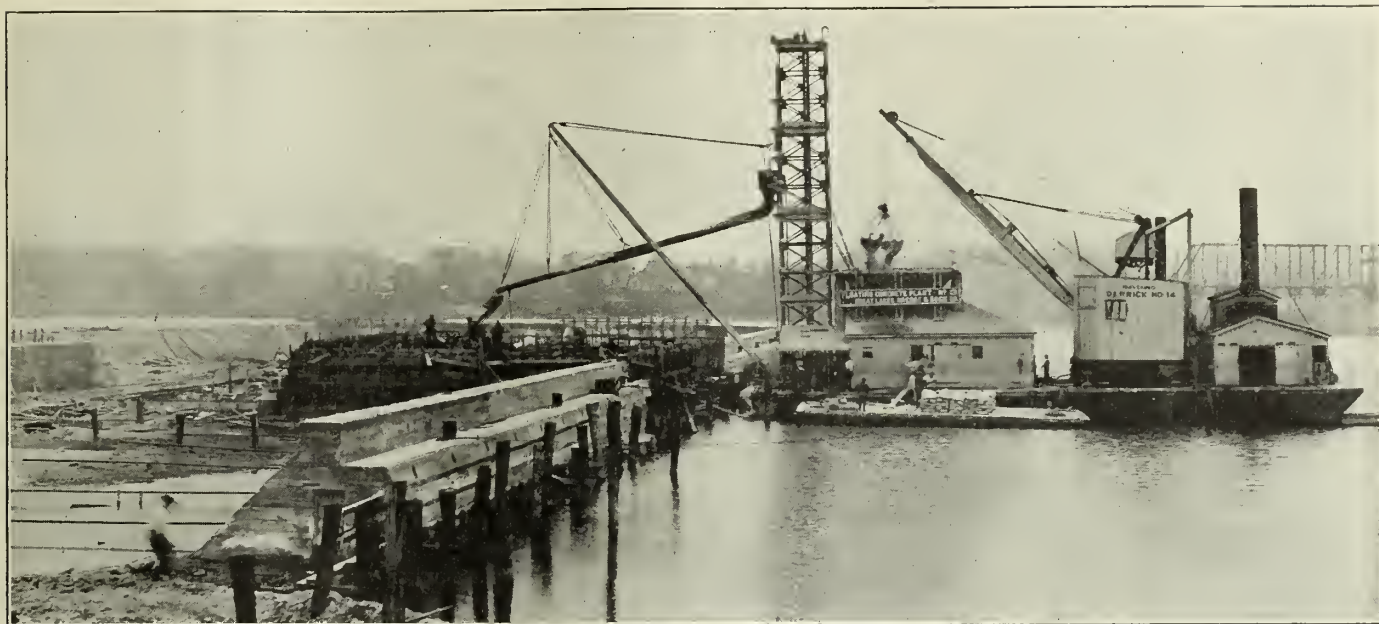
Floating Concrete Plant Depositing Concrete for Down-stream Car Dumper Foundation, Hocking Valley Ry., East Toledo, Ohio.
